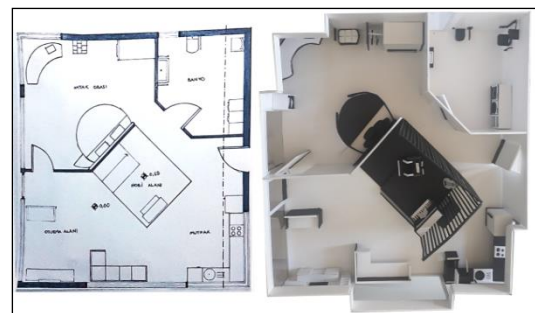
Plan and model top view of the example house of Student Group 5 - Accessibility.
